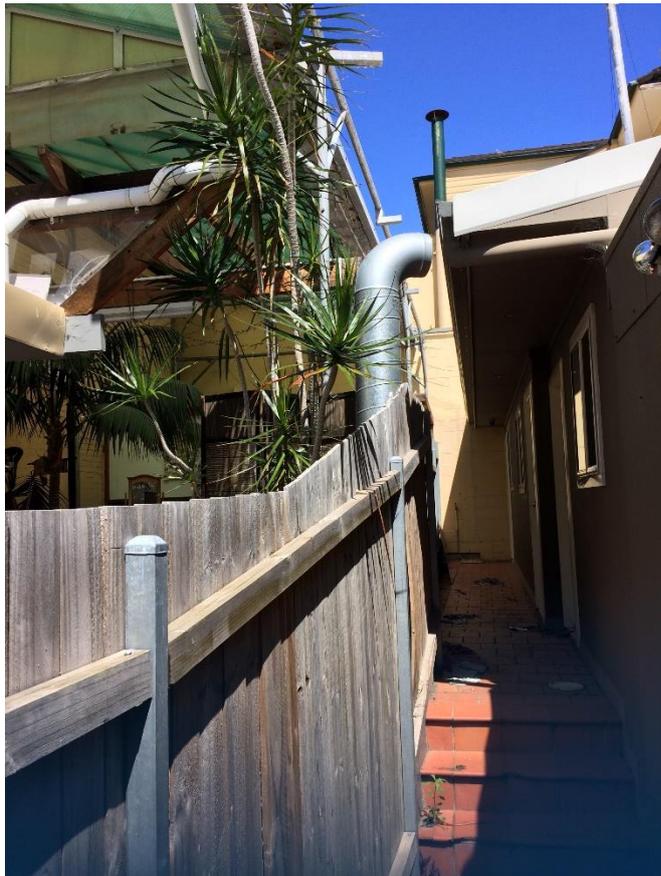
Looking along the boundary of 178 St Johns Road (left) and 180 St Johns Road (right).
